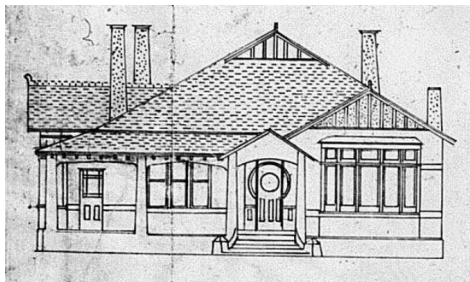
Plans of 67 Mayne Street (Accessed via City of Launceston Records)
